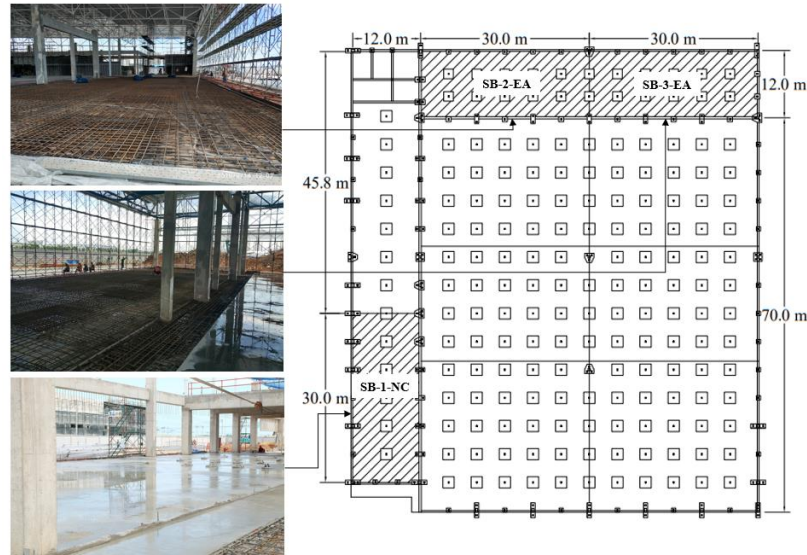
Plan view and site condition of the investigated slab on beam at construction site 1
